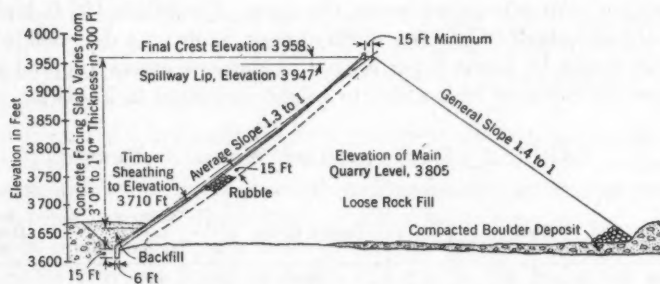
CROSS-SECTION OF SALT SPRINGS DAM IN CALIFORNIA
